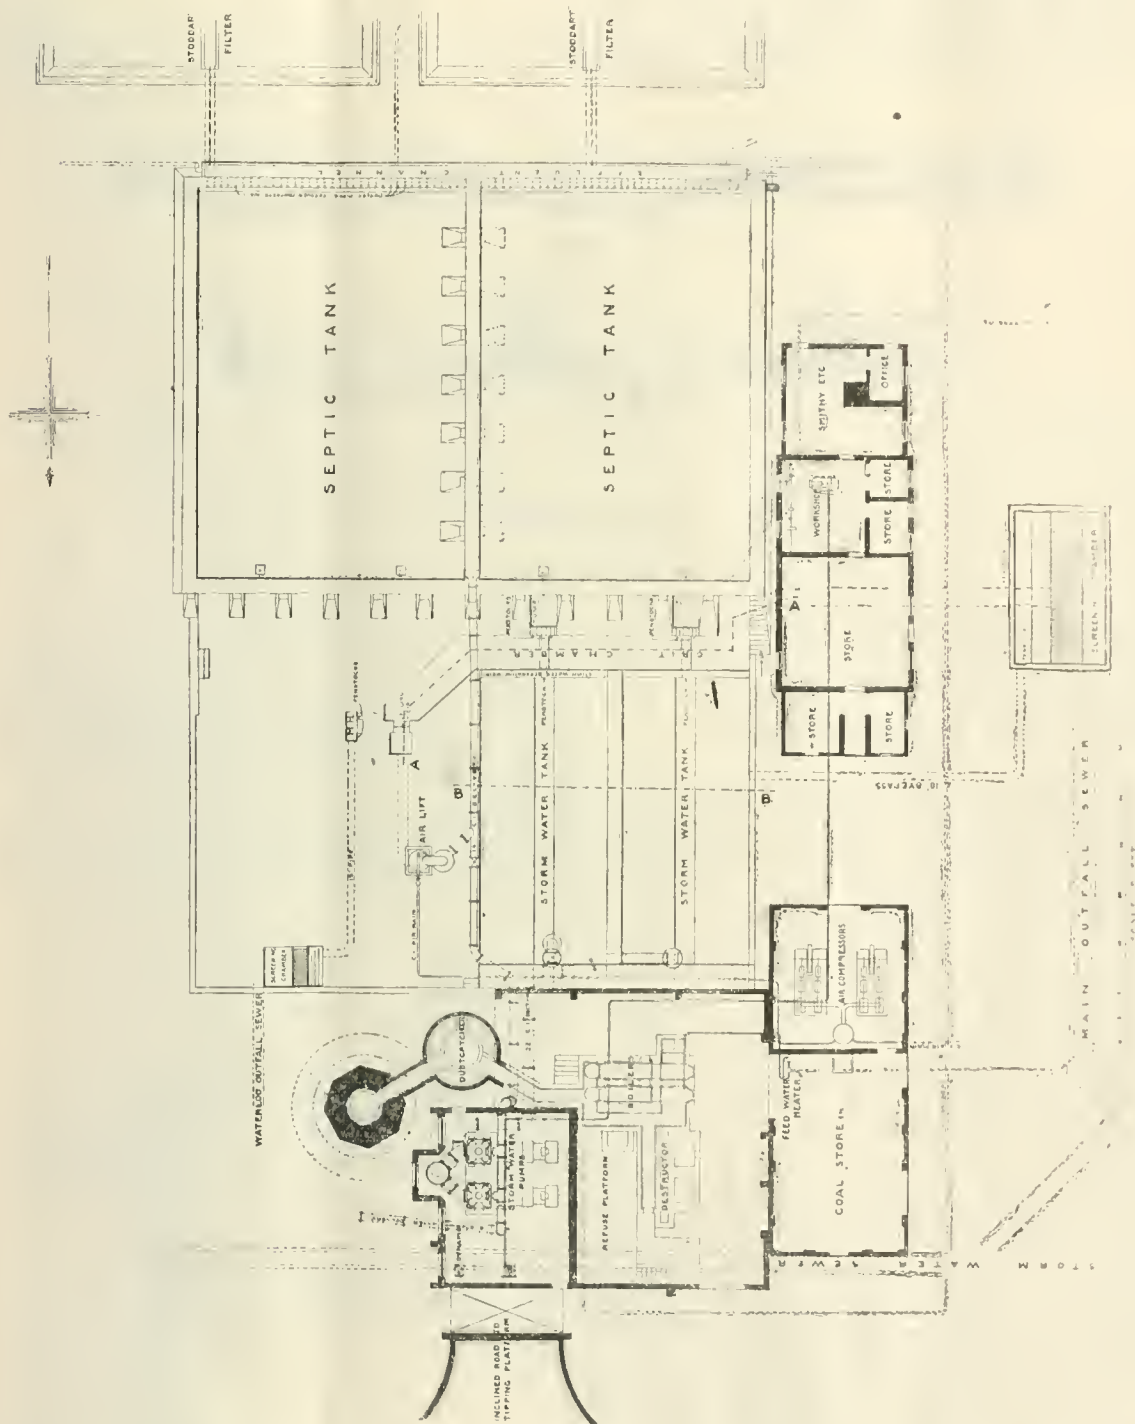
DETAIL PLAN OF SEWAGE DISPOSAL WORKS.
